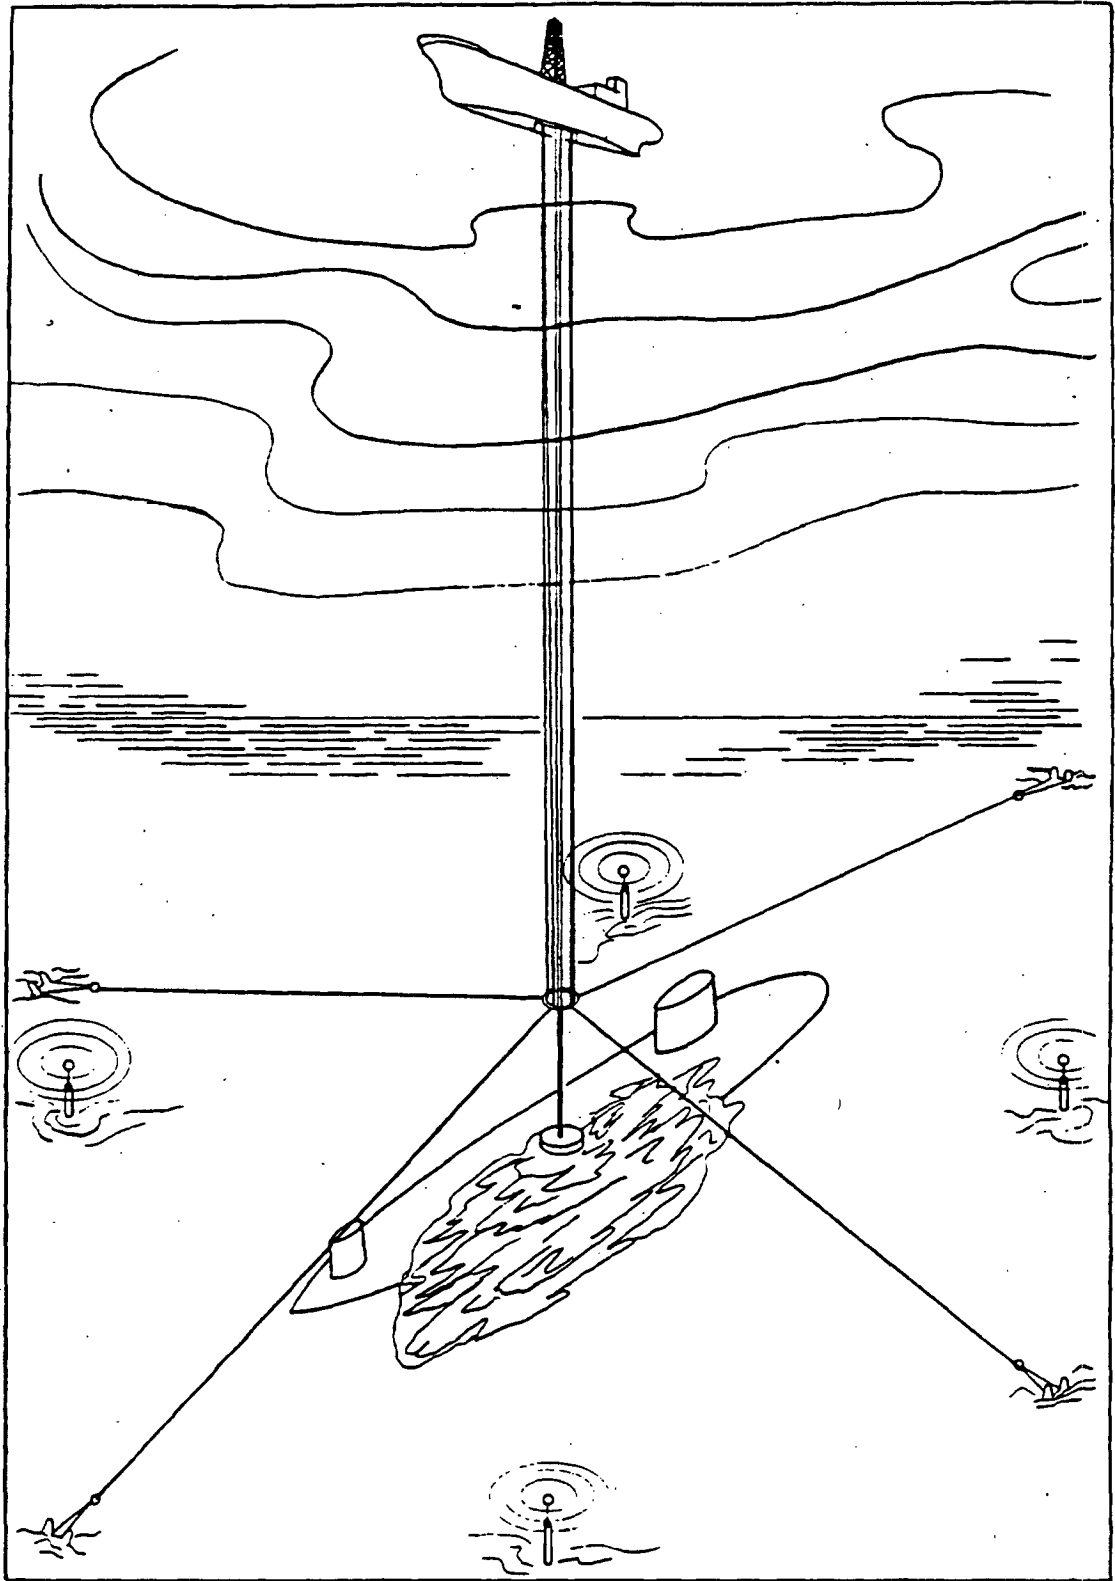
Drill Ship Placing Concrete Over a Submarine
